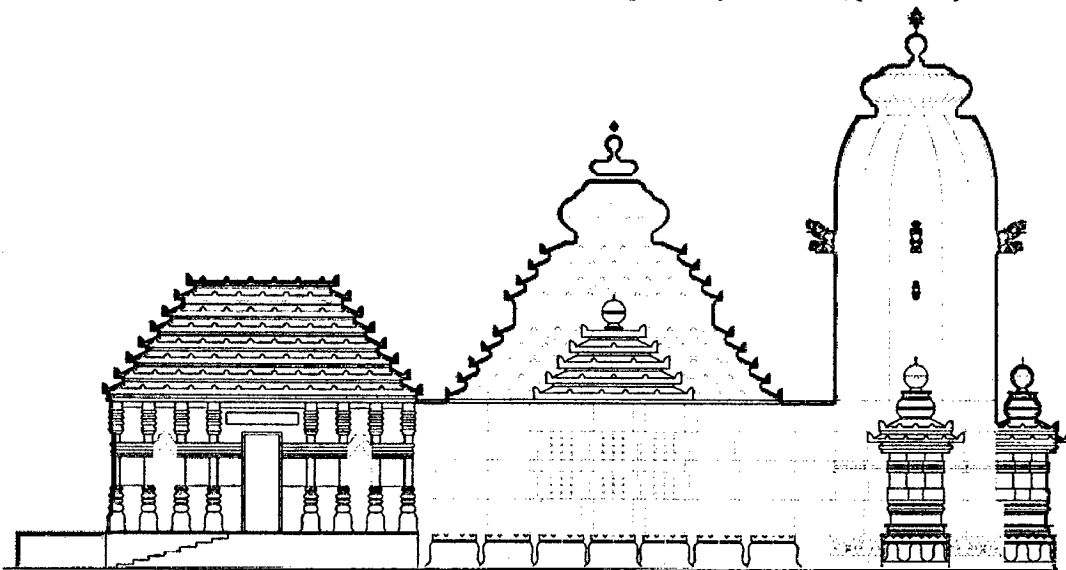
Right Side Elevation of Jagannath Temple, khandapara
